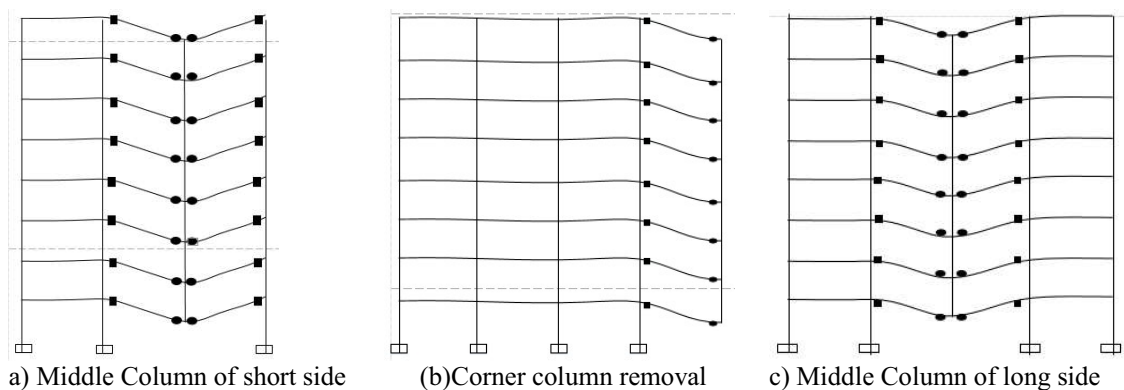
Deformed shape and Plastic Hinge states for Unbraced Frame
